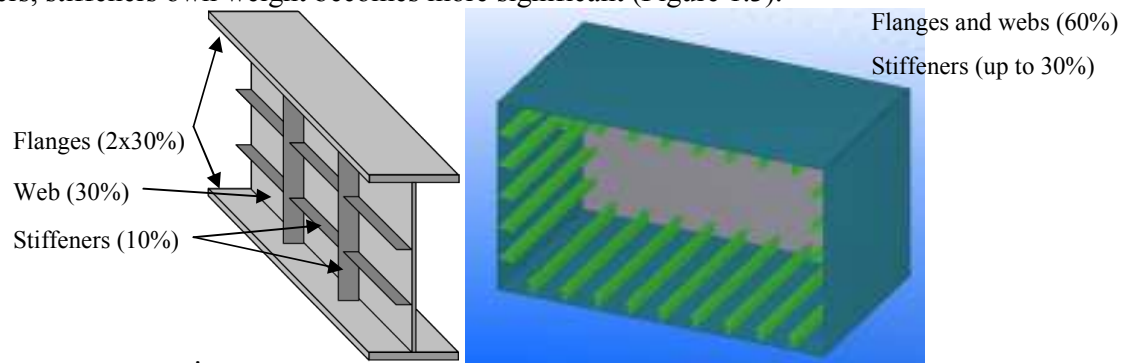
Typical own weight ratios in stiffened plates: plate girders (left) and box girders (right)
